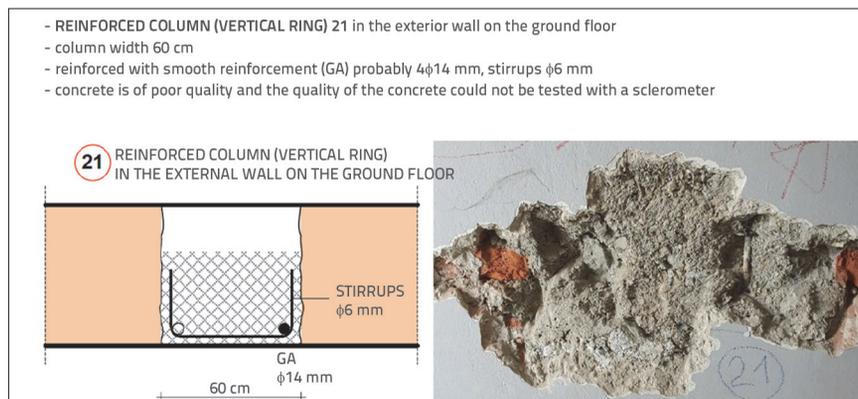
Examples of conducting investigation works on load-bearing elements of concrete elements within masonry walls [7]
